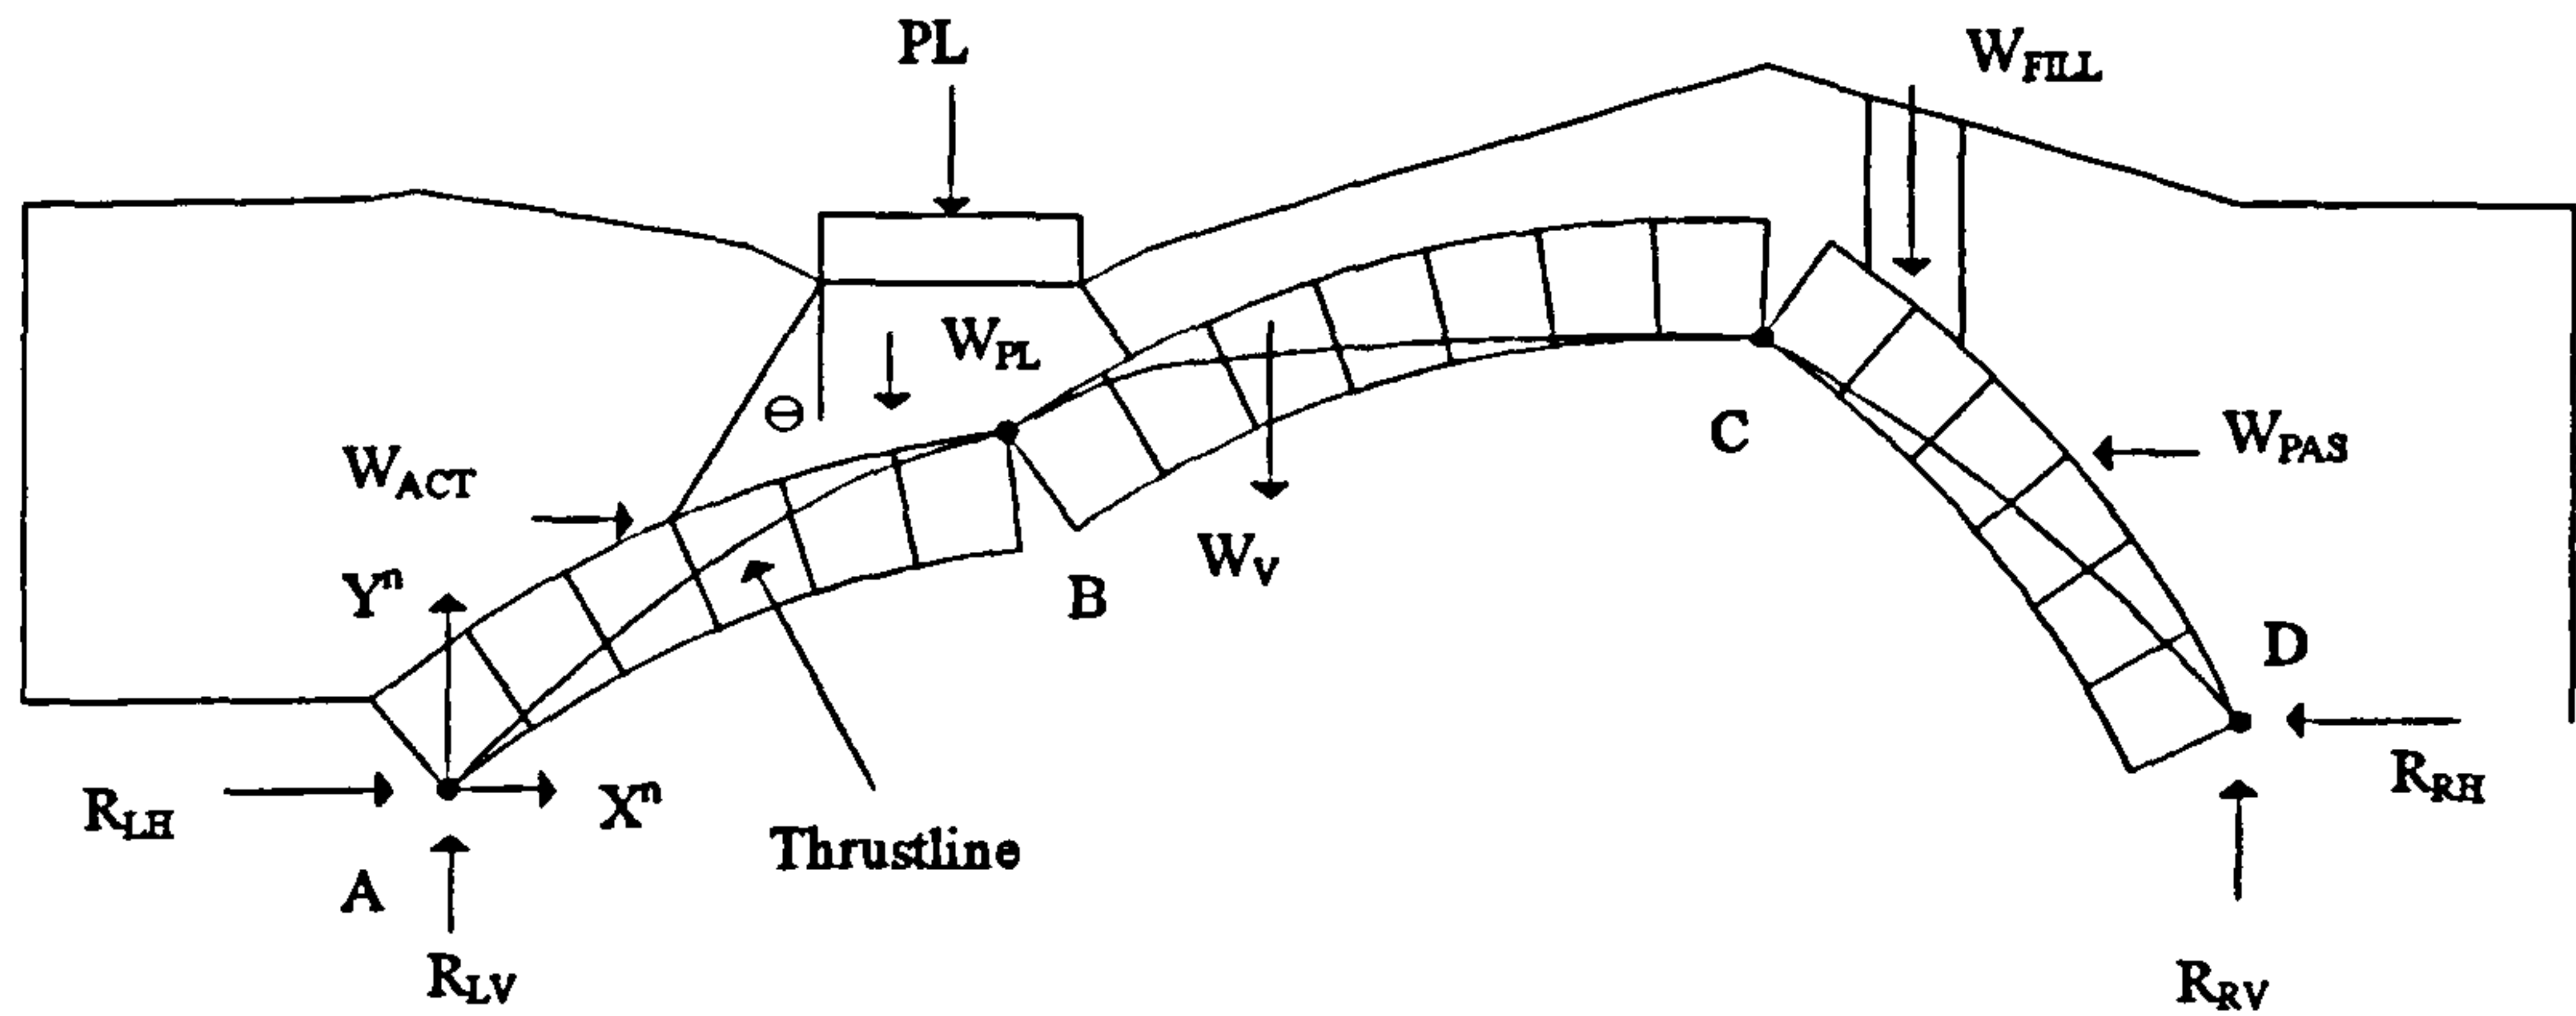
Idealisation of a typical arch bridge showing its failure mechanism
